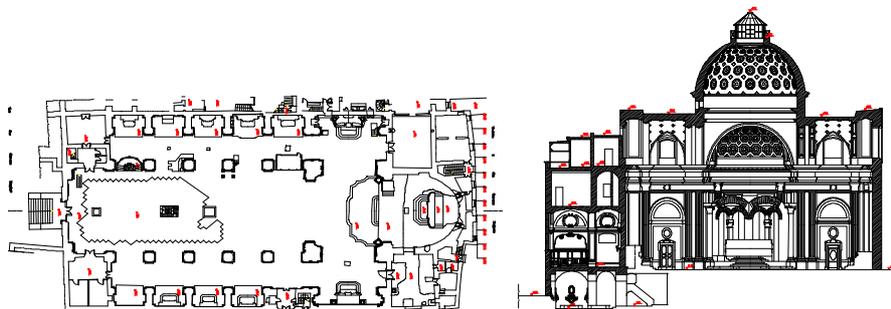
Plan and transversal section of the san Giovanni Maggiore church.
